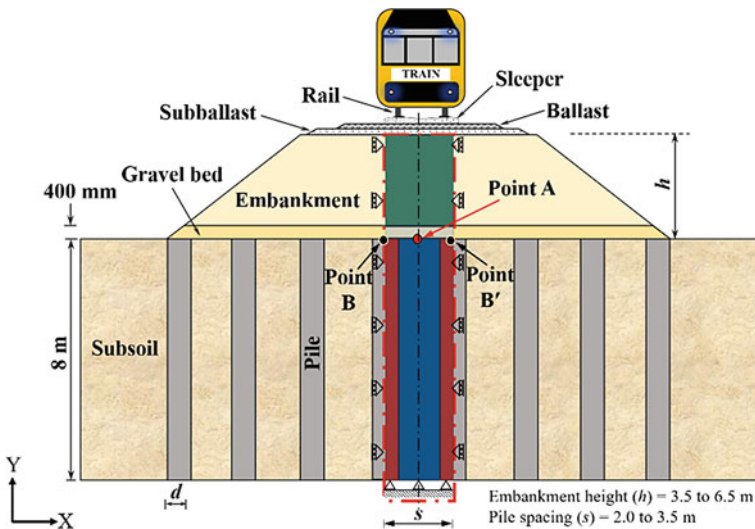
Typical pile-supported railway embankment with modeled unit cell (modified from Meena et al. [9])
